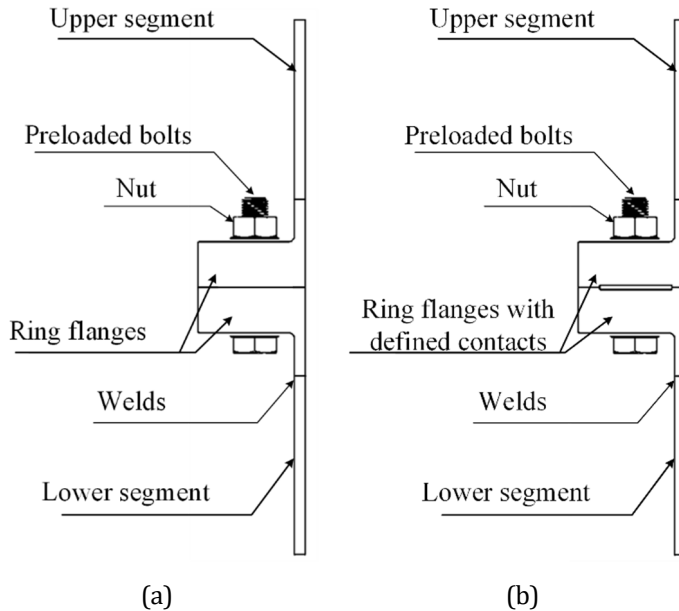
(a) Ring flange connection (RF); (b) Ring flange connection with defined contacts (RFD)
